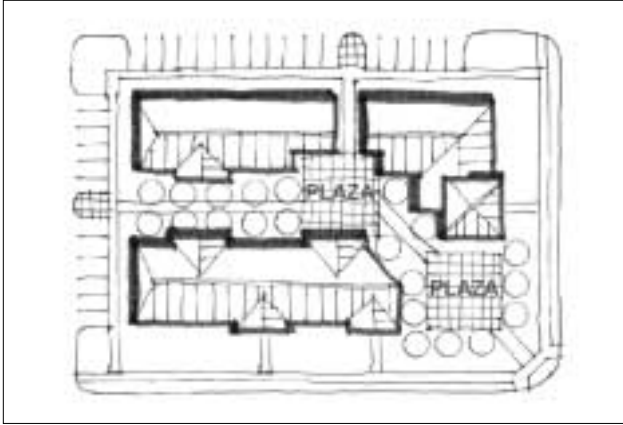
Office buildings oriented to street and to plaza or green space become important elements of the streetscape.
